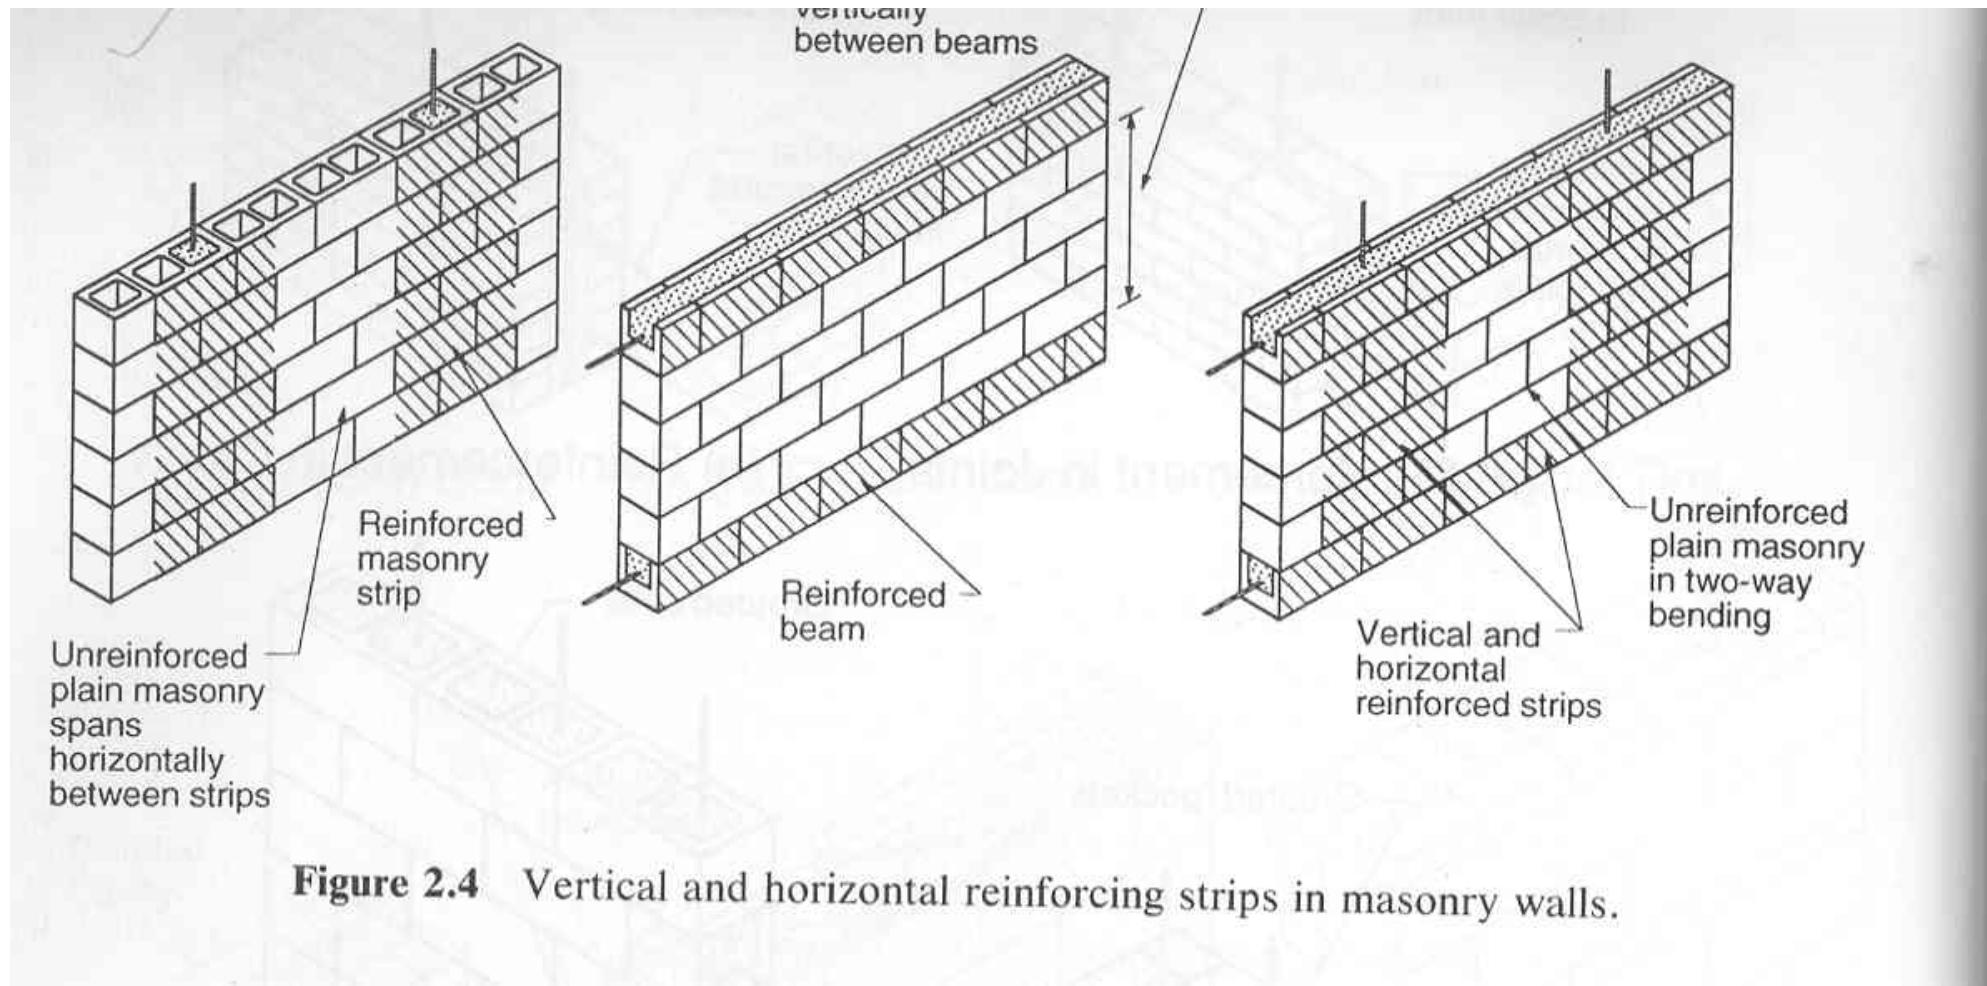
Vertical and horizontal reinforcing strips in masonry walls.
